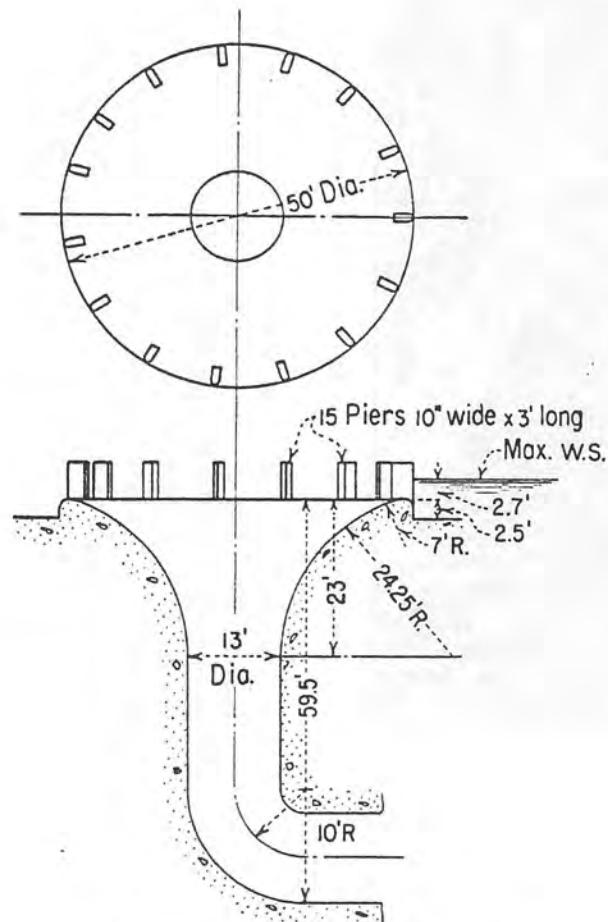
PONTIAN KETCHIL DAM SPILLWAY
